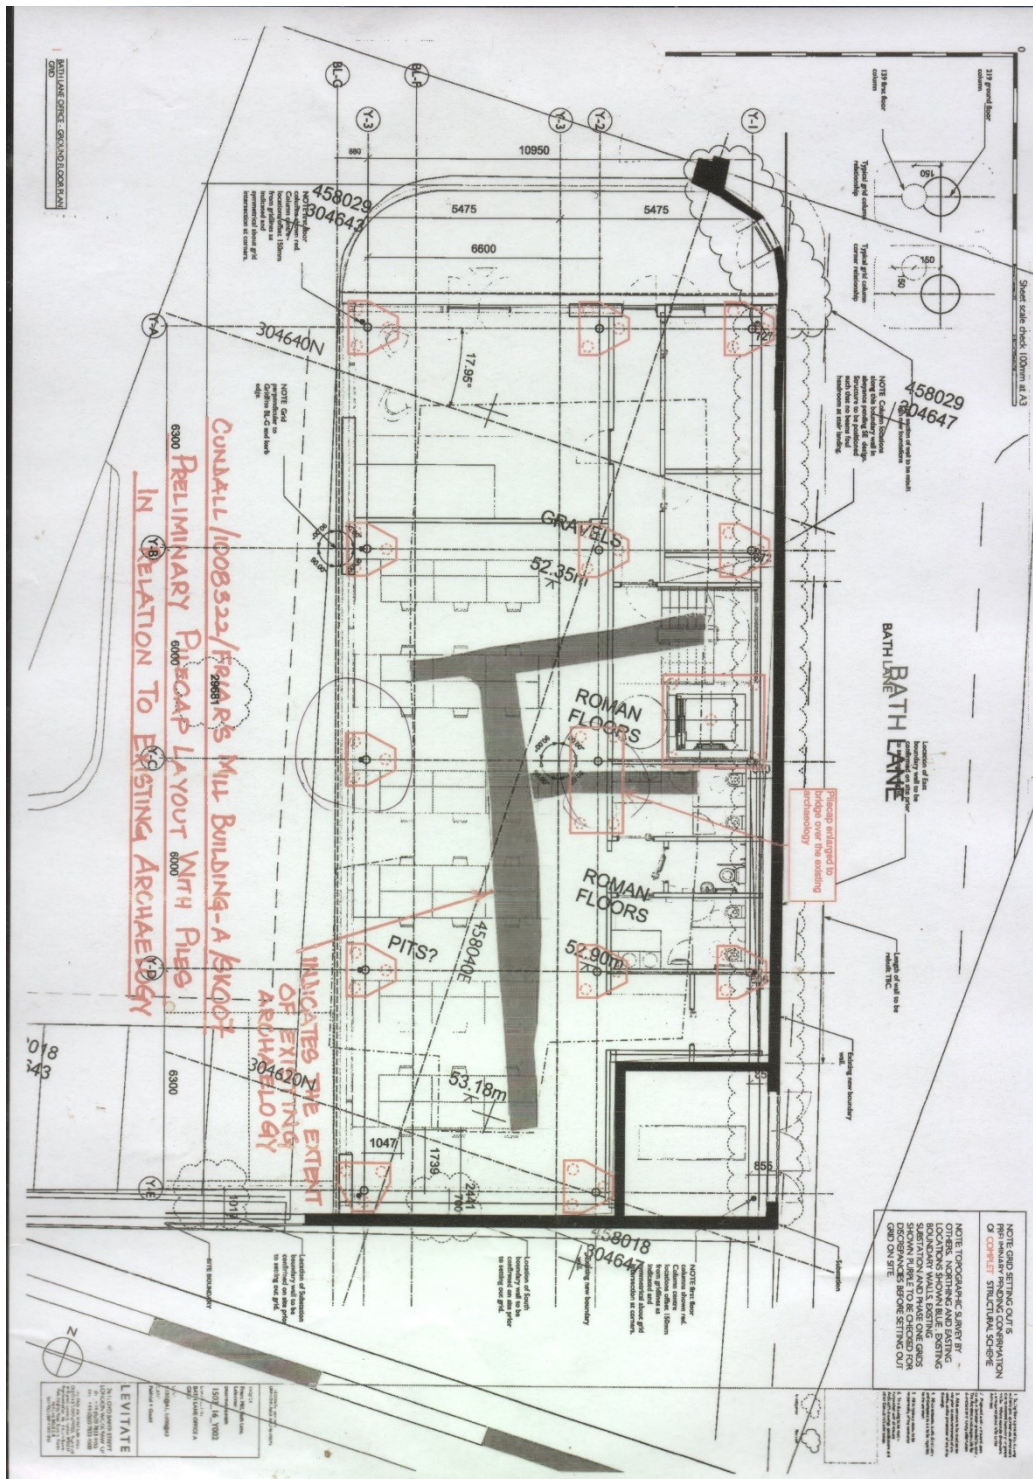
Draft piling plan in relation to archaeology. North to top. Not to scale
